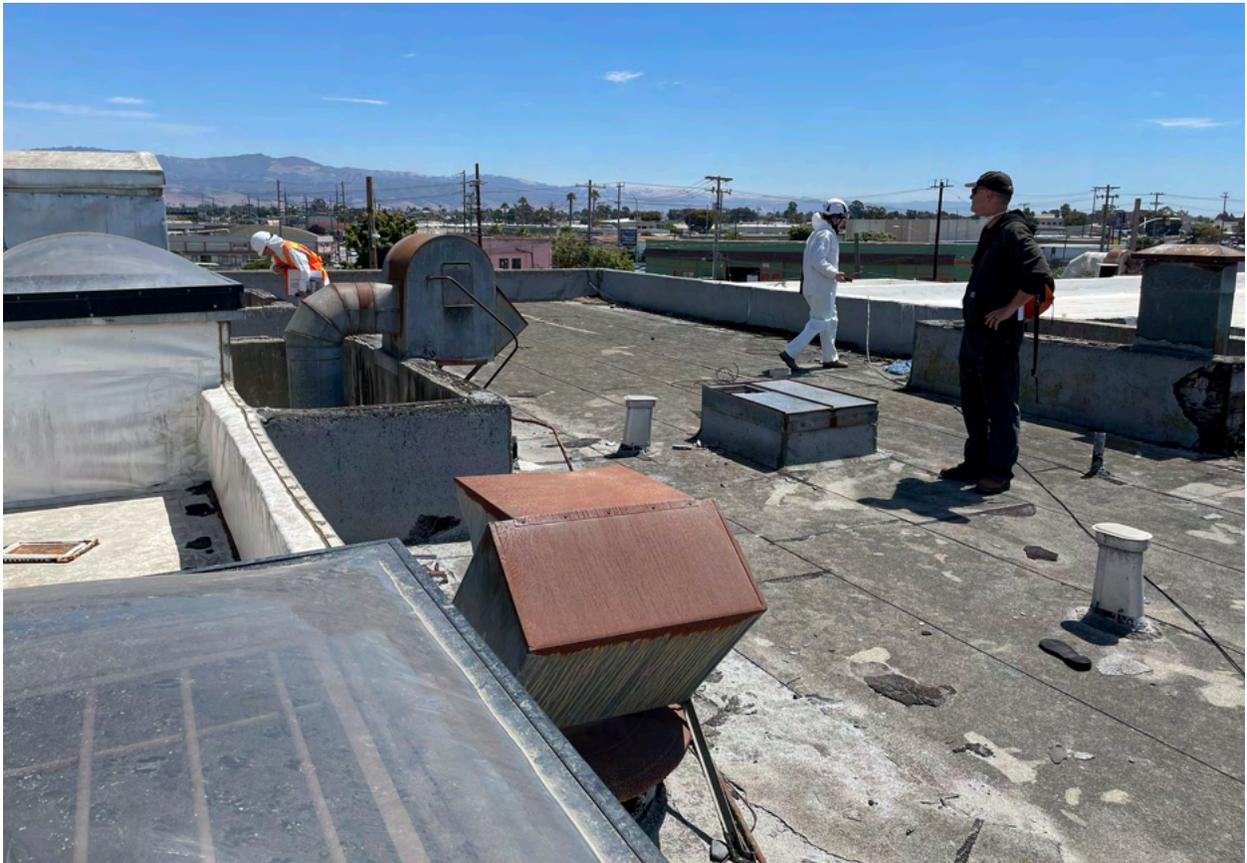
(Top) Roof of 39 Soledad, facing southwest, Groundwork Preservation LLC, 2025.
